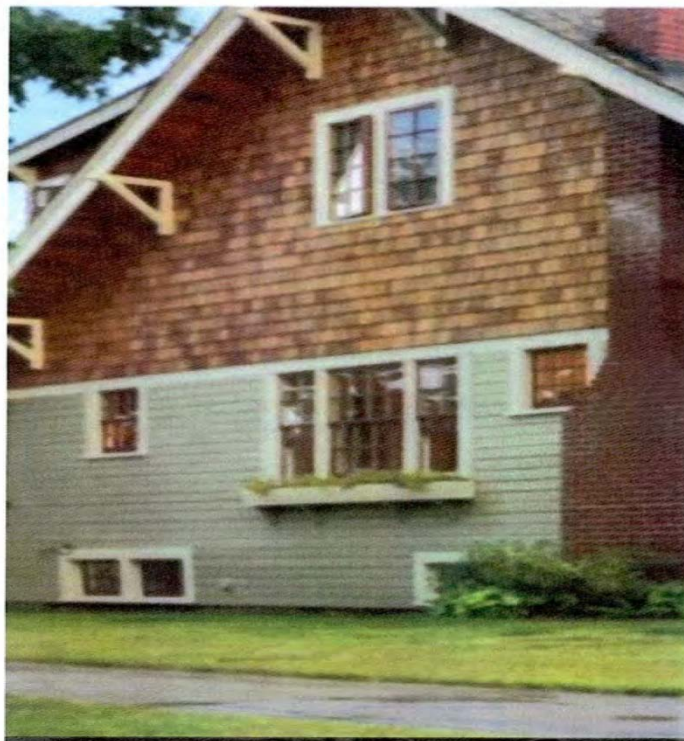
Northern elevation showing the cedar shakes proposed for Southern elevation
